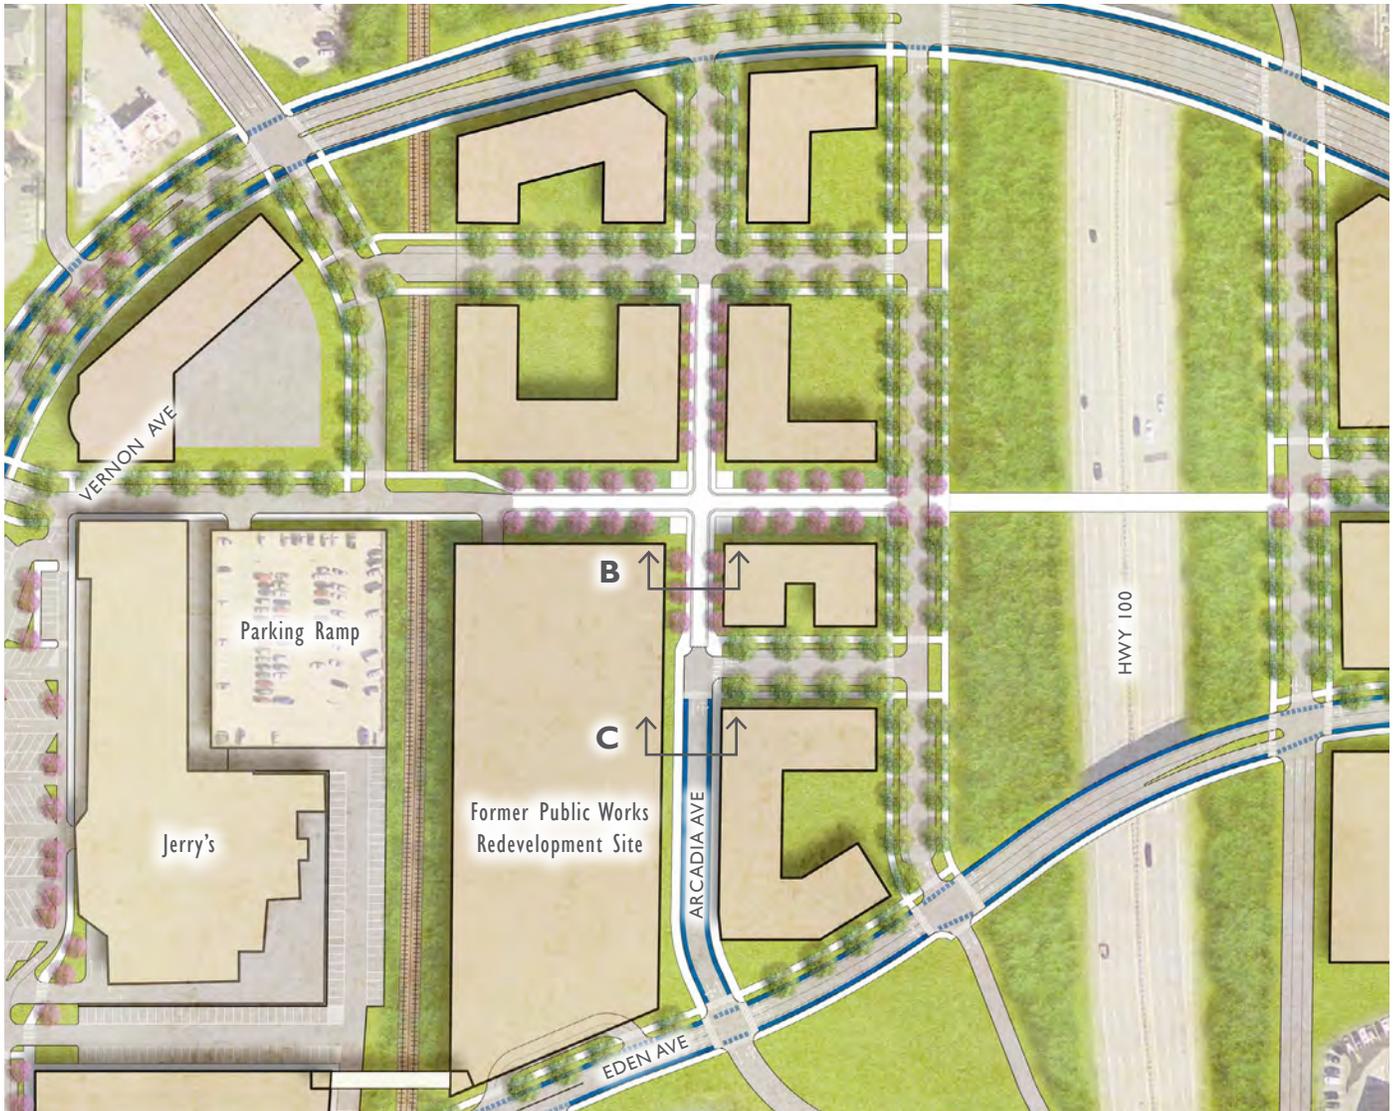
Plan of the new proposed Community Center and redevelopment on the former Public Works site, with a shared street along Arcadia Avenue and the new east/west pedestrian and vehicular connection north of the site; 1" = 200'.
